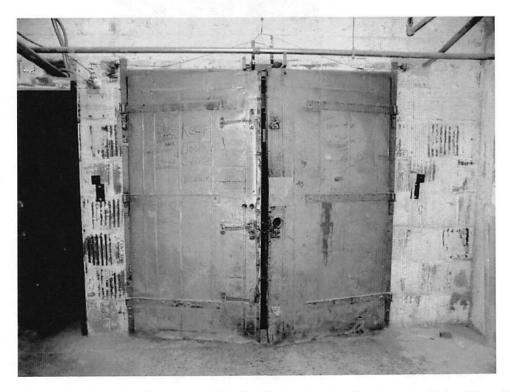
Interior, basement Unit E, elevator fire shutter door, looking east.
